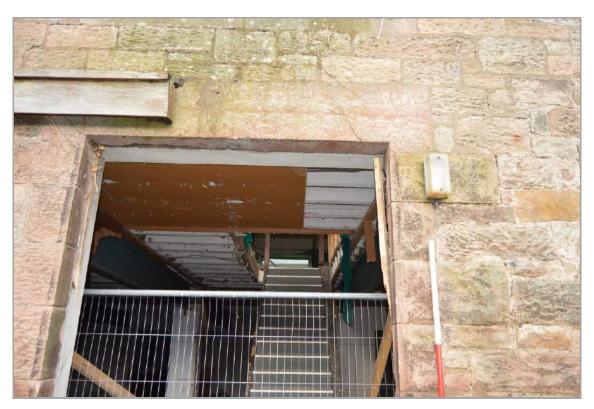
View of doorways in south elevation (facing north west). Scale 2m.
